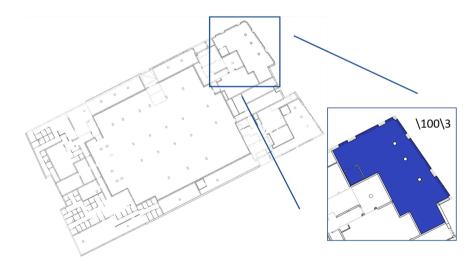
Architectural plan that illustrates Organellen \100\3, at Plan 9. The floor plan is generated from the property formation model in Fig. 14.
